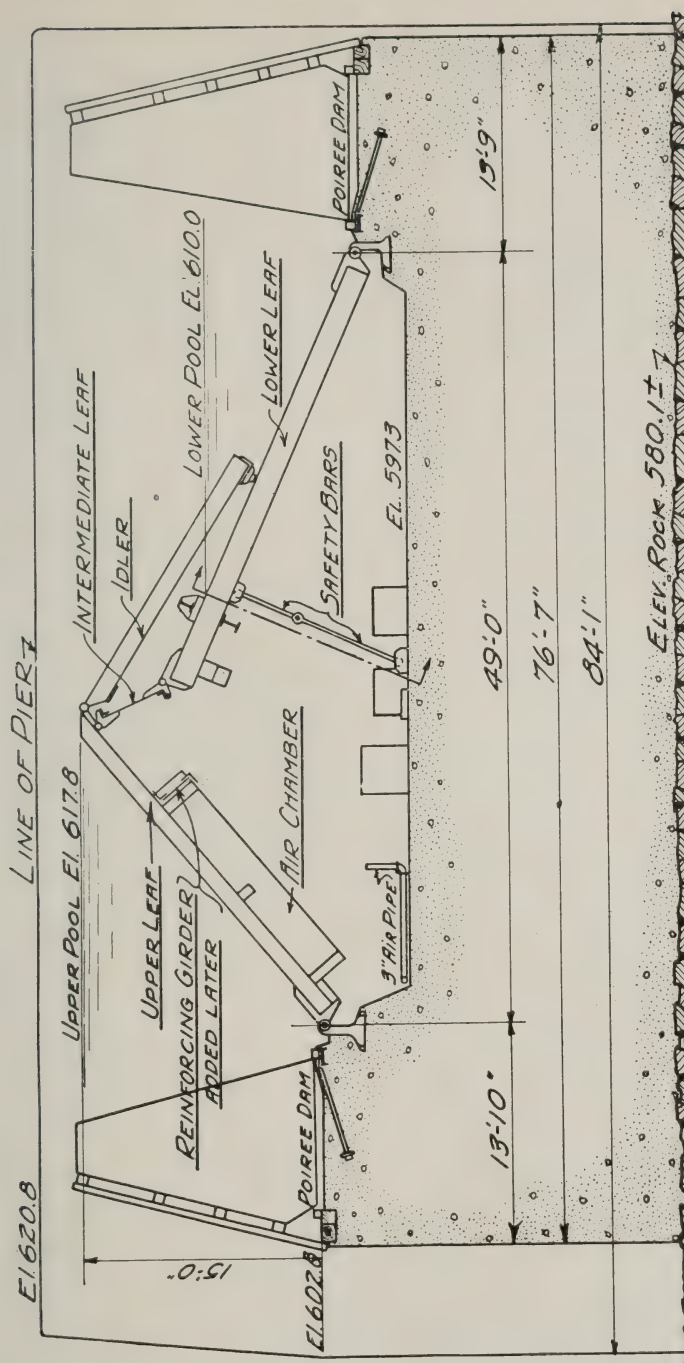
Showing cross section of large Reversed Parker Bear-Trap No. 13, Ohio River. The Poiree Dams with foundations and pier extensions and reinforcing girder were not constructed originally.
